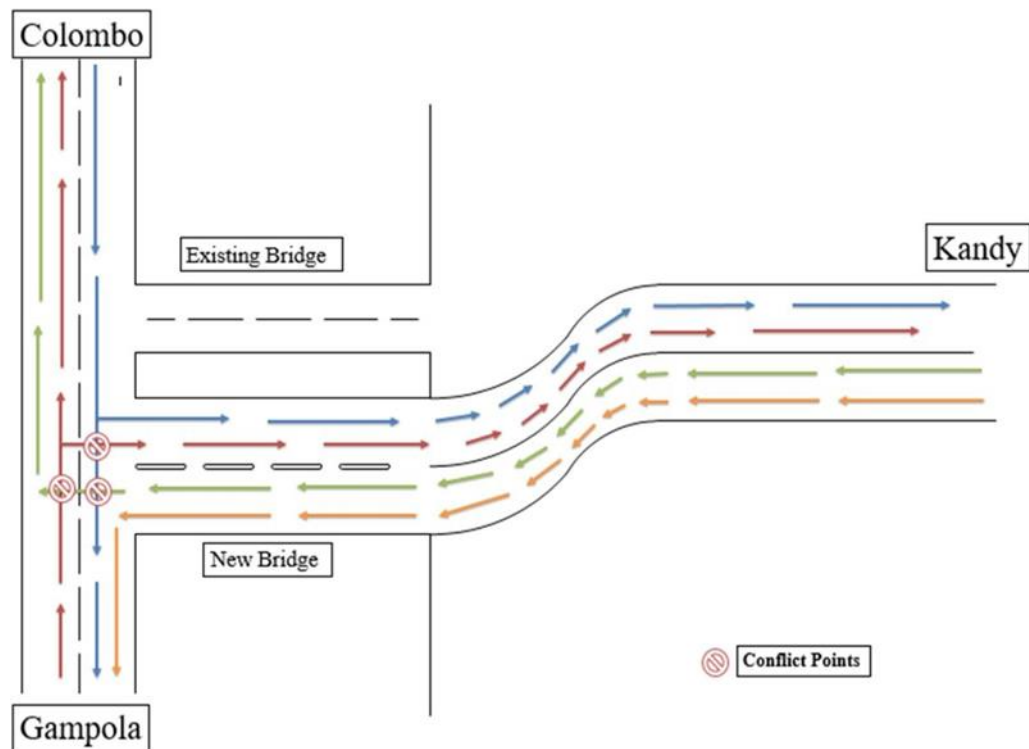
Sketch showing the new bridge, existing bridge and traffic directions in alternative 4
